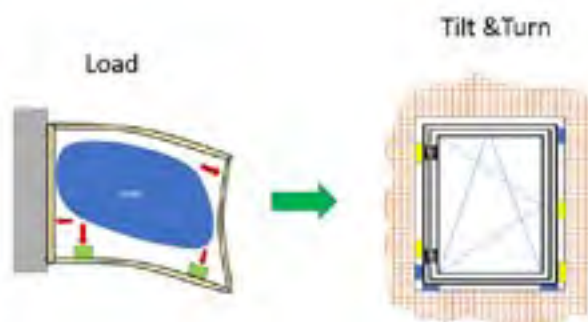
Shimming for tilt & turn window (Technical Manual of Windows Installation, POVAS 2019)
